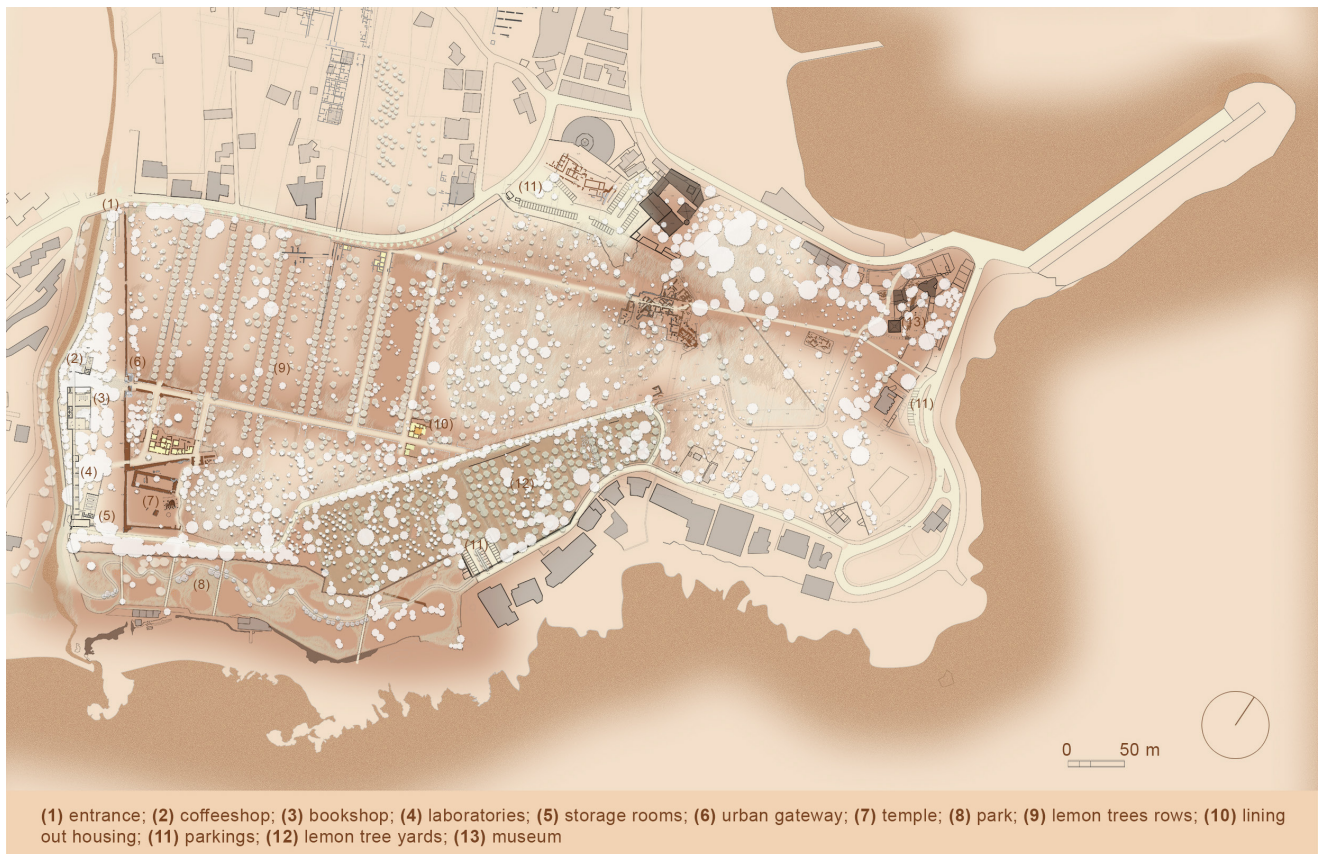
Plan of the proposal with new paths and interventions (author's drawing).
